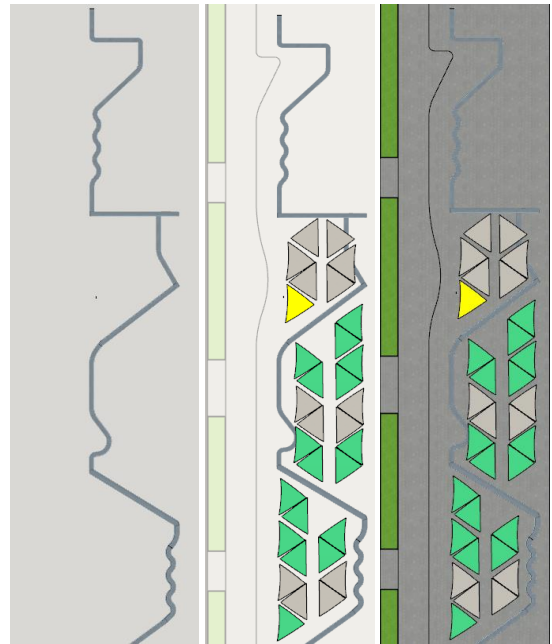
Master plan of "Static space" in proposed design model on Thang Long sidewalk
